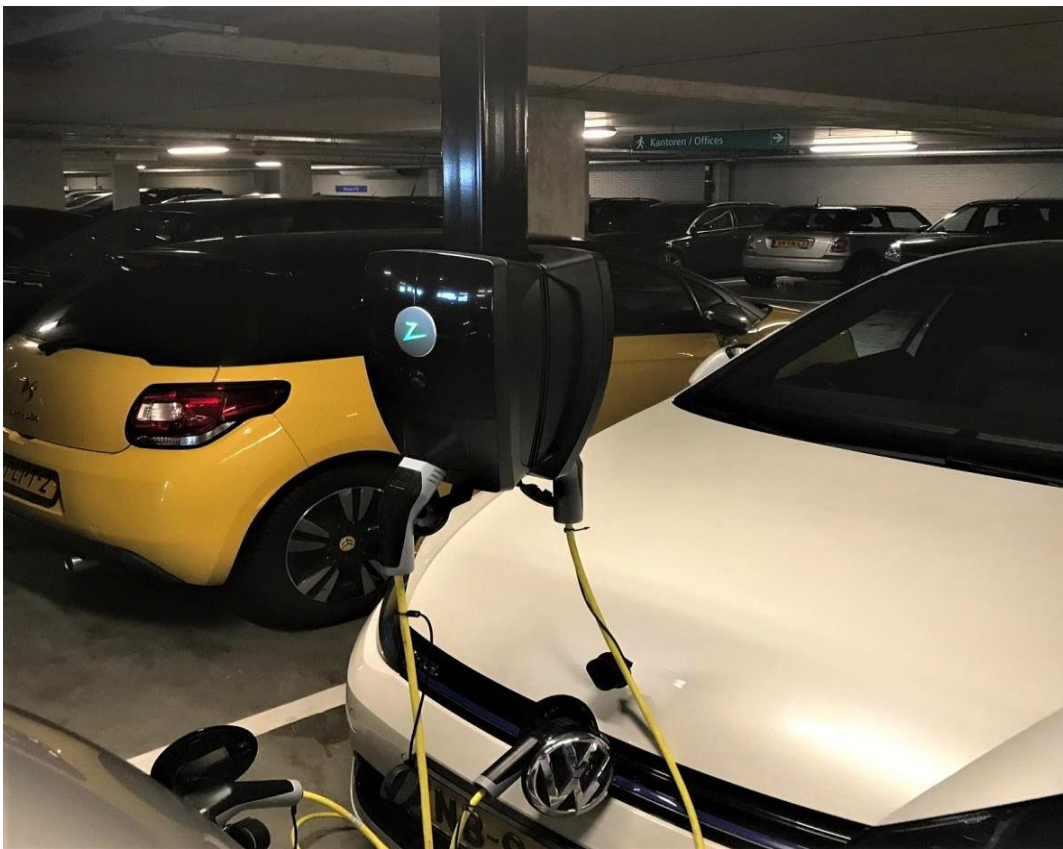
Ziptec Pro Soffit Column Mount Installation
